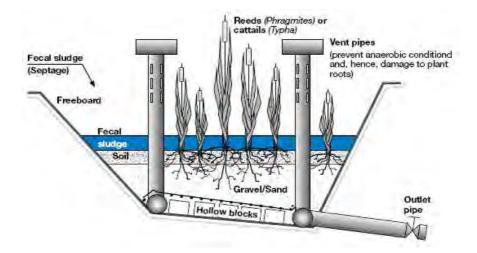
Planted constructed wetlands (Glanville, 2006)
